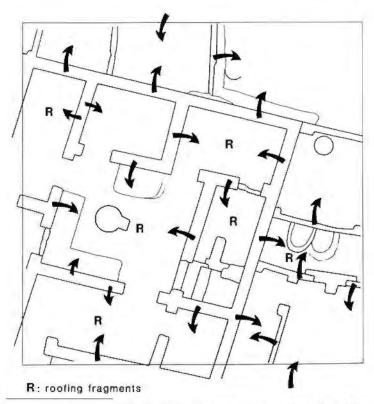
Outline plan of house P46.33, indicating likely principal directions of wall collapse, and those areas in which roofing fragments were found.
